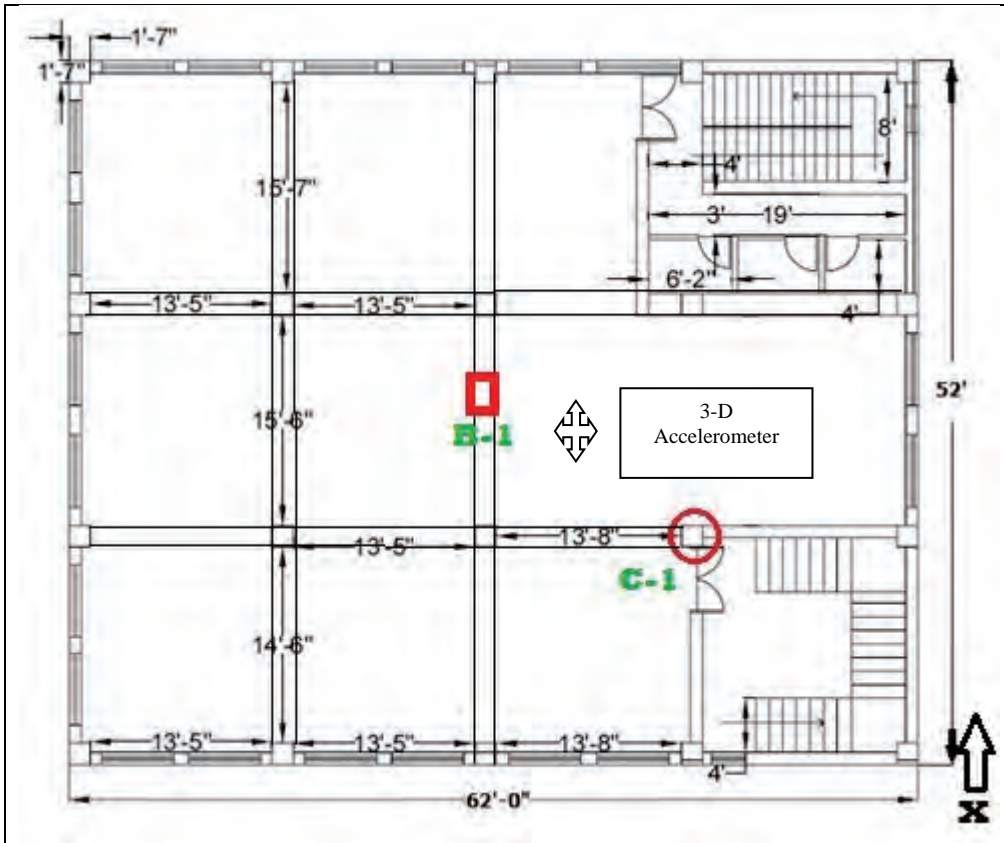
Typical floor plan of Jamal Sardar Community Centre
